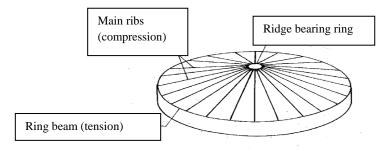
Detail of Cone dome with main ribs, ridge bearing ring, ring beam (Sinan, 1988.pp148)
